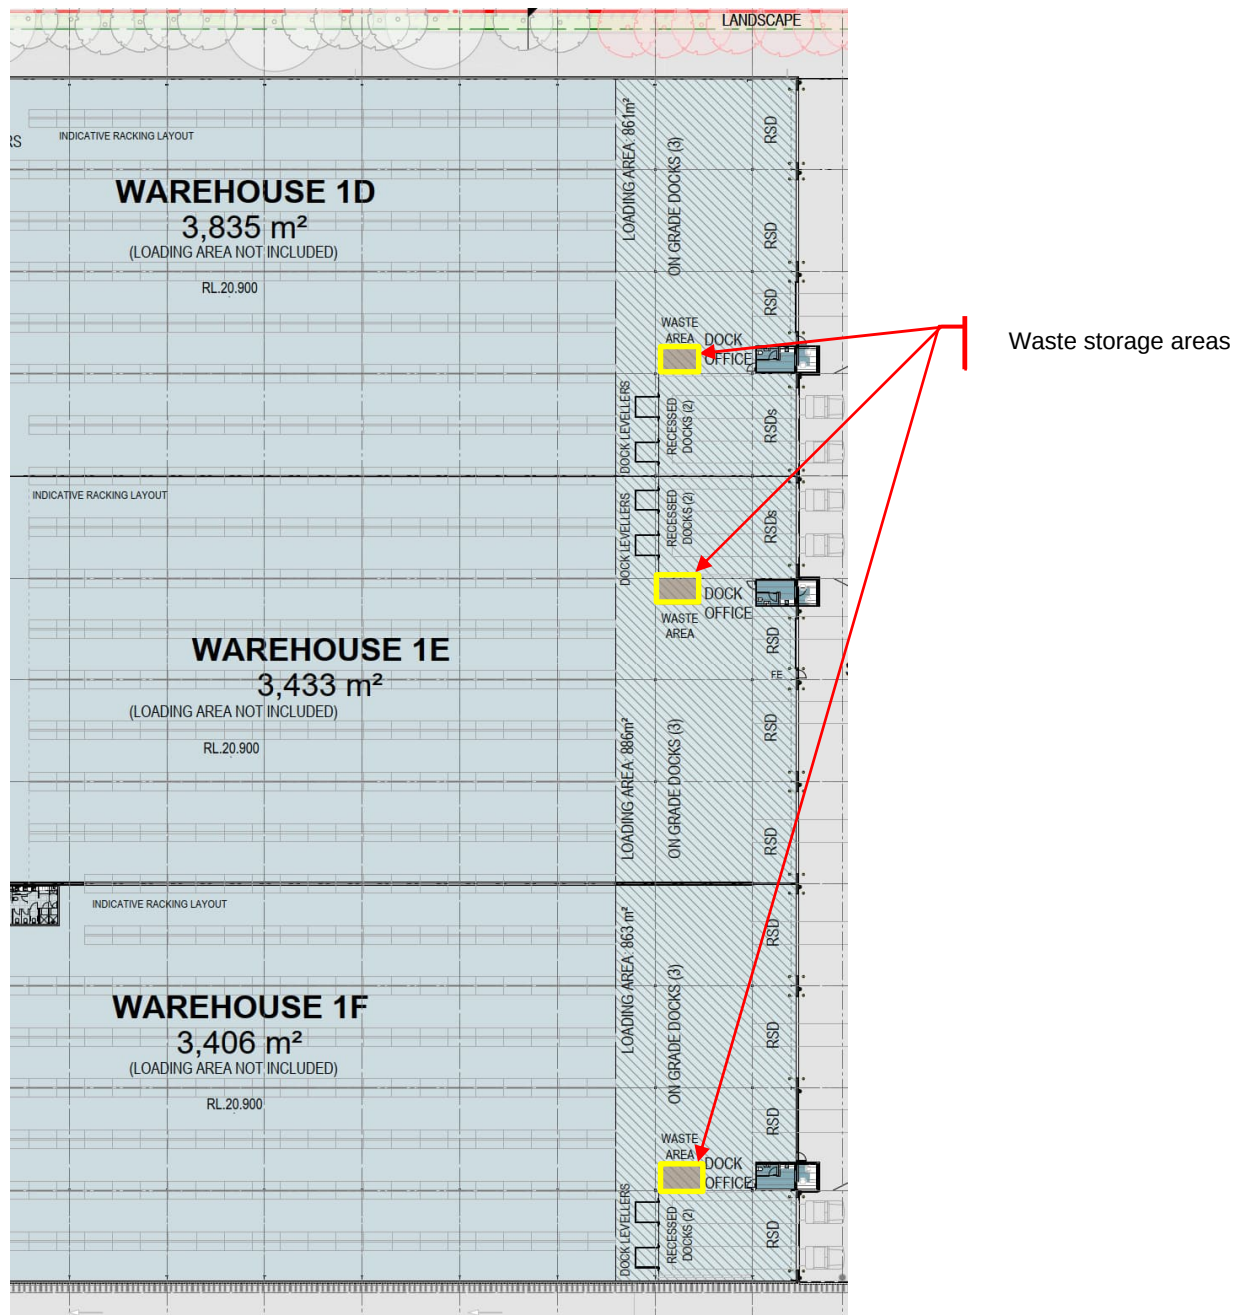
Warehouse 1D, 1E and 1F waste storage locations
